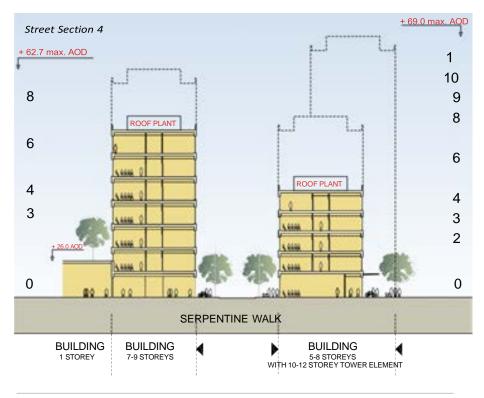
Section 4 illustrates a section along Serpentine Way at Broadstone Gate. The buildings are 7-9 storey on the south side of the route and 5-8 storey in height with 10-12 storey tower element on the north side. Figure 4.6 establishes that the buildings will be a maximum of 62.7 and 69.0 metres above ordnance datum respectively, including any rooftop plant.
